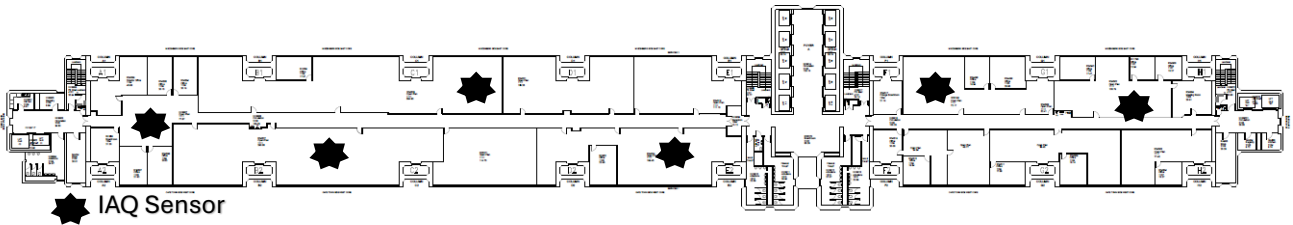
Tower Building proposed sensor positioning 8th floor (6)
